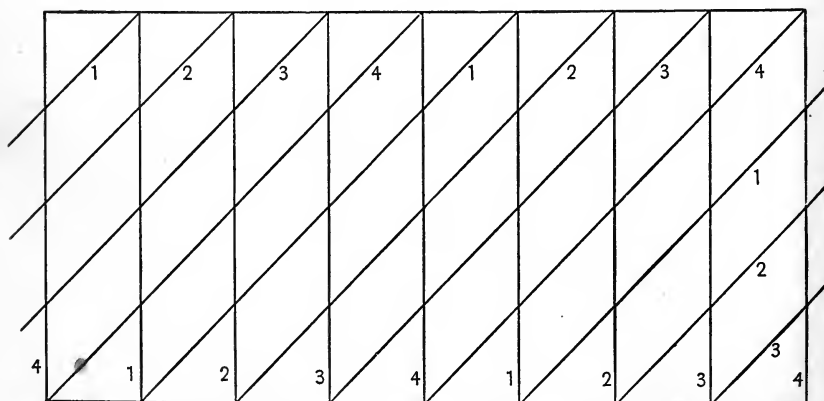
TRUSS SYSTEMS OF NIAGARA BRIDGE.
